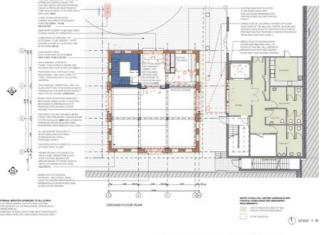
Proposed Ground Floor Plan, NTS. Archer Office
